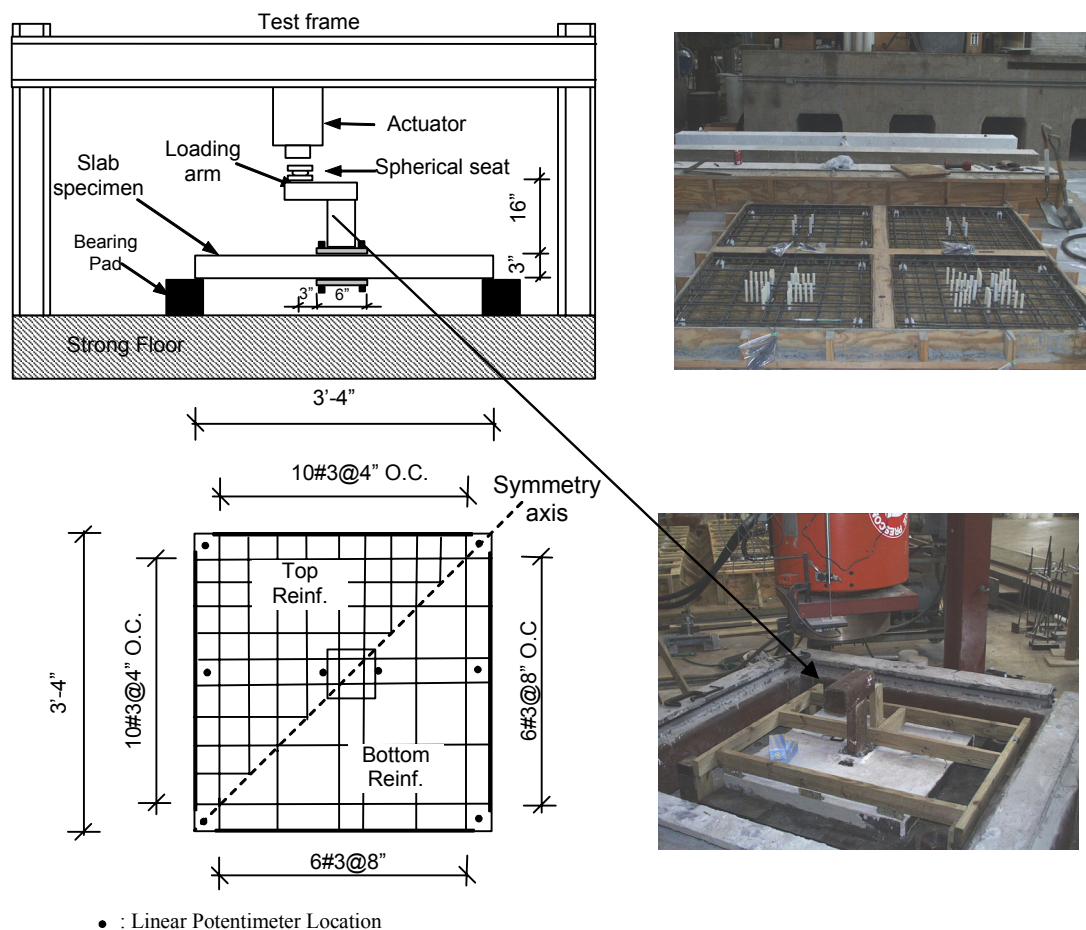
Instrumentation, Reinforcement Details, and Test-Setup
